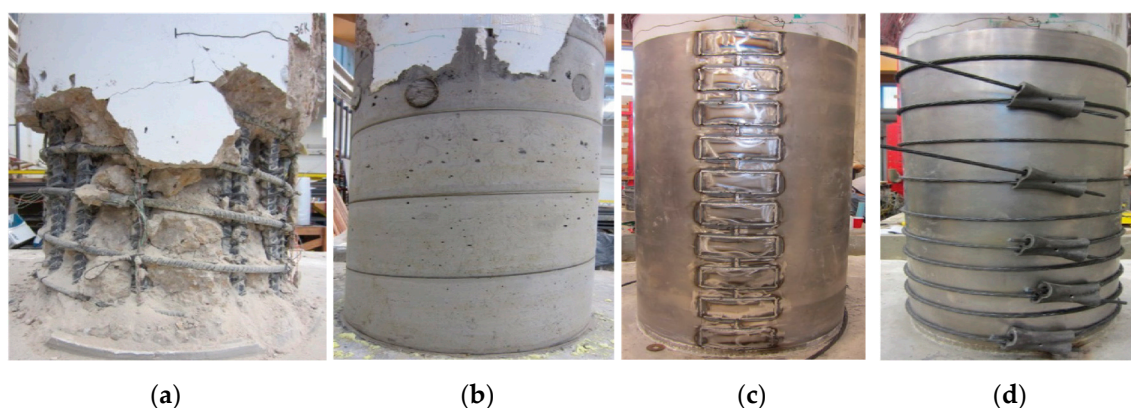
Repair procedure with the hybrid confining jacket: (a) Damaged column; (b) Patched column with repair grout; (c) Sheet metal wrapping; (d) Prestressing strands application [101-SAGE Copyrights].
